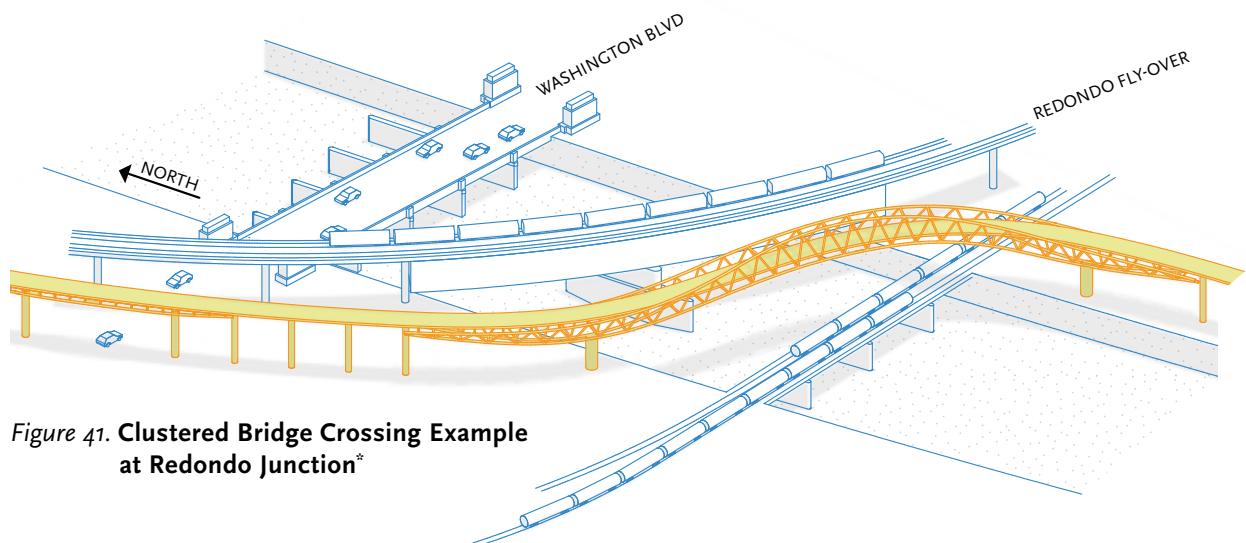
Clustered Bridge Crossing Example at Redondo Junction
